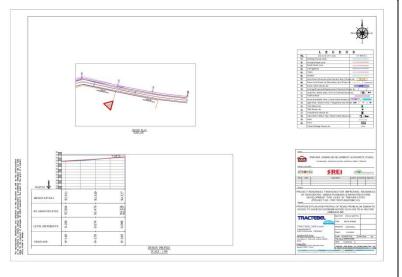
Proposed plan and Profile of the Roads- Ambassa
